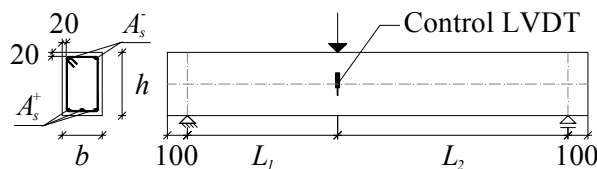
Beam geometry, support and loading conditions [dimensions in mm] (Barros et al. 2011).
